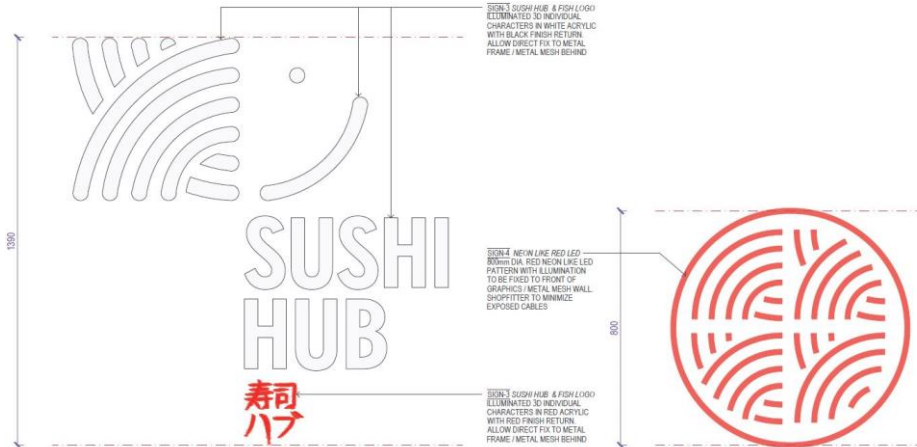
Signage proposed for elevation 2. (Source: Avance Design 2022).
